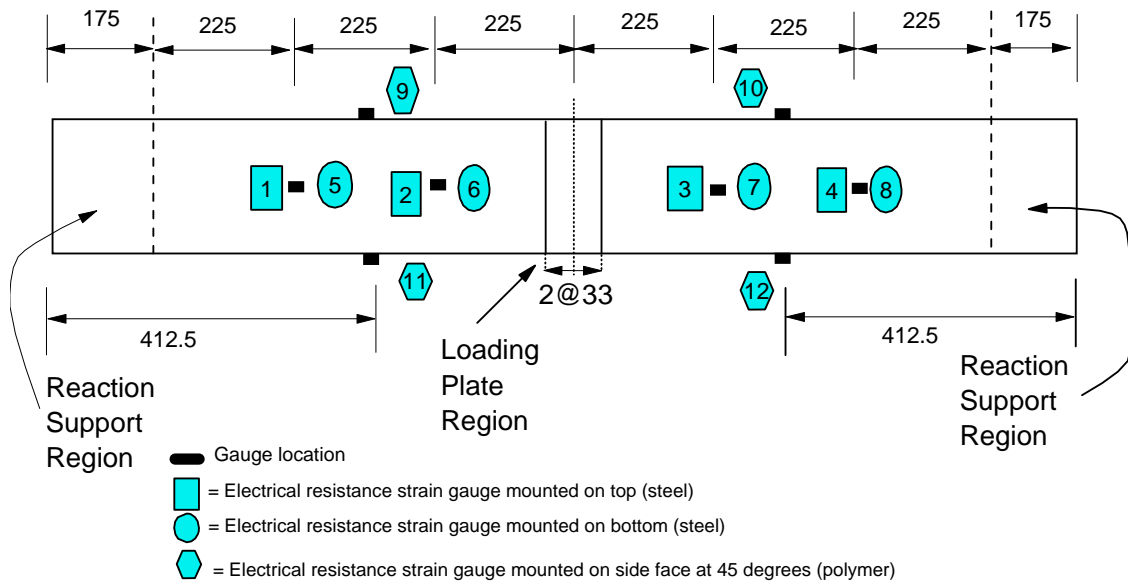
Strain gauge locations for set B fatigue specimens.
